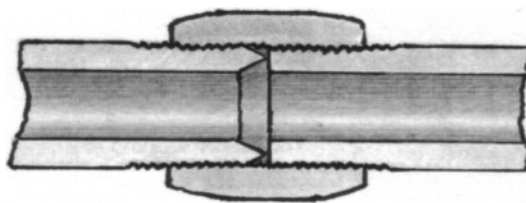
Section through a Perkins left- and right-handed thread joint
